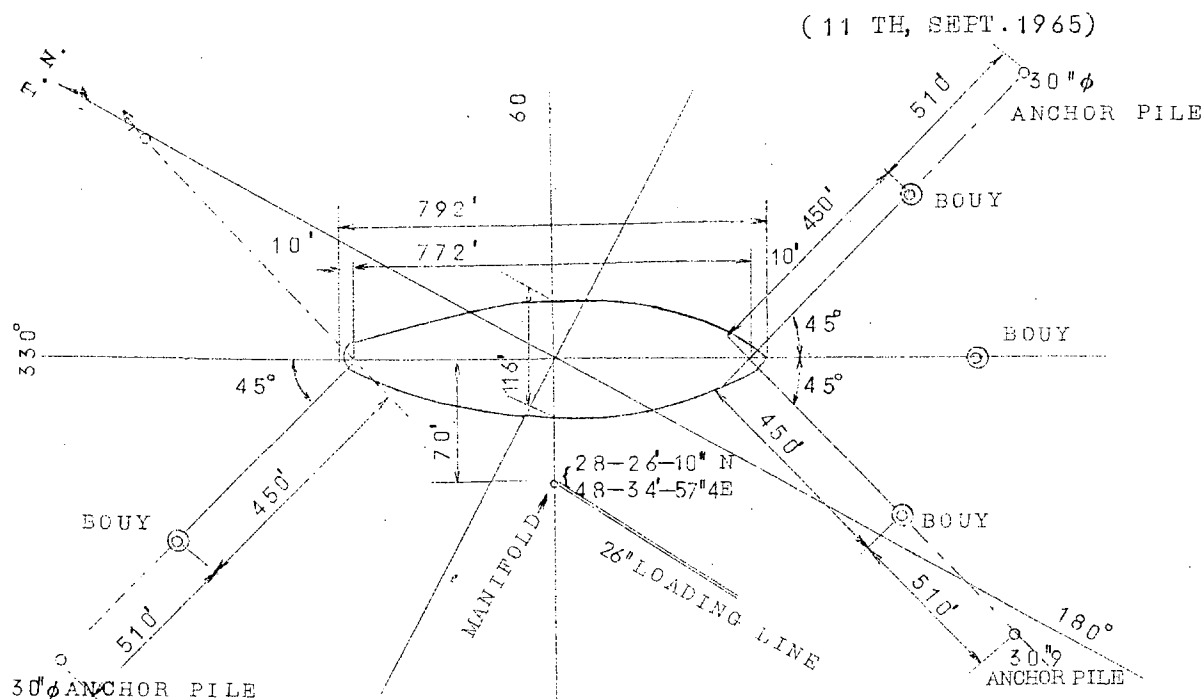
C THE PROPOSED PLAN OF TANKER MOORING SYSTEM
